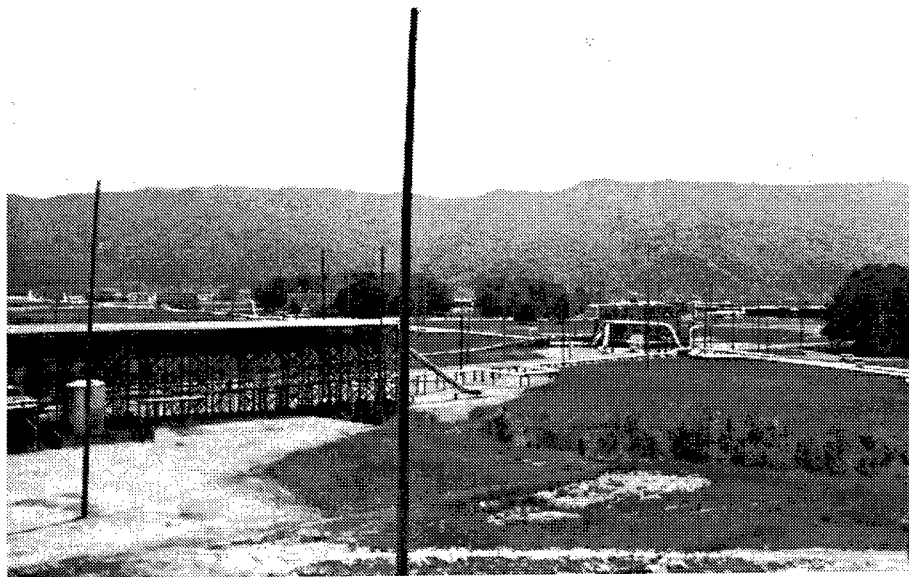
Building D2: Explosives Manufacturing Plant, Reactor Leg with Washing Building E2 in the background.
